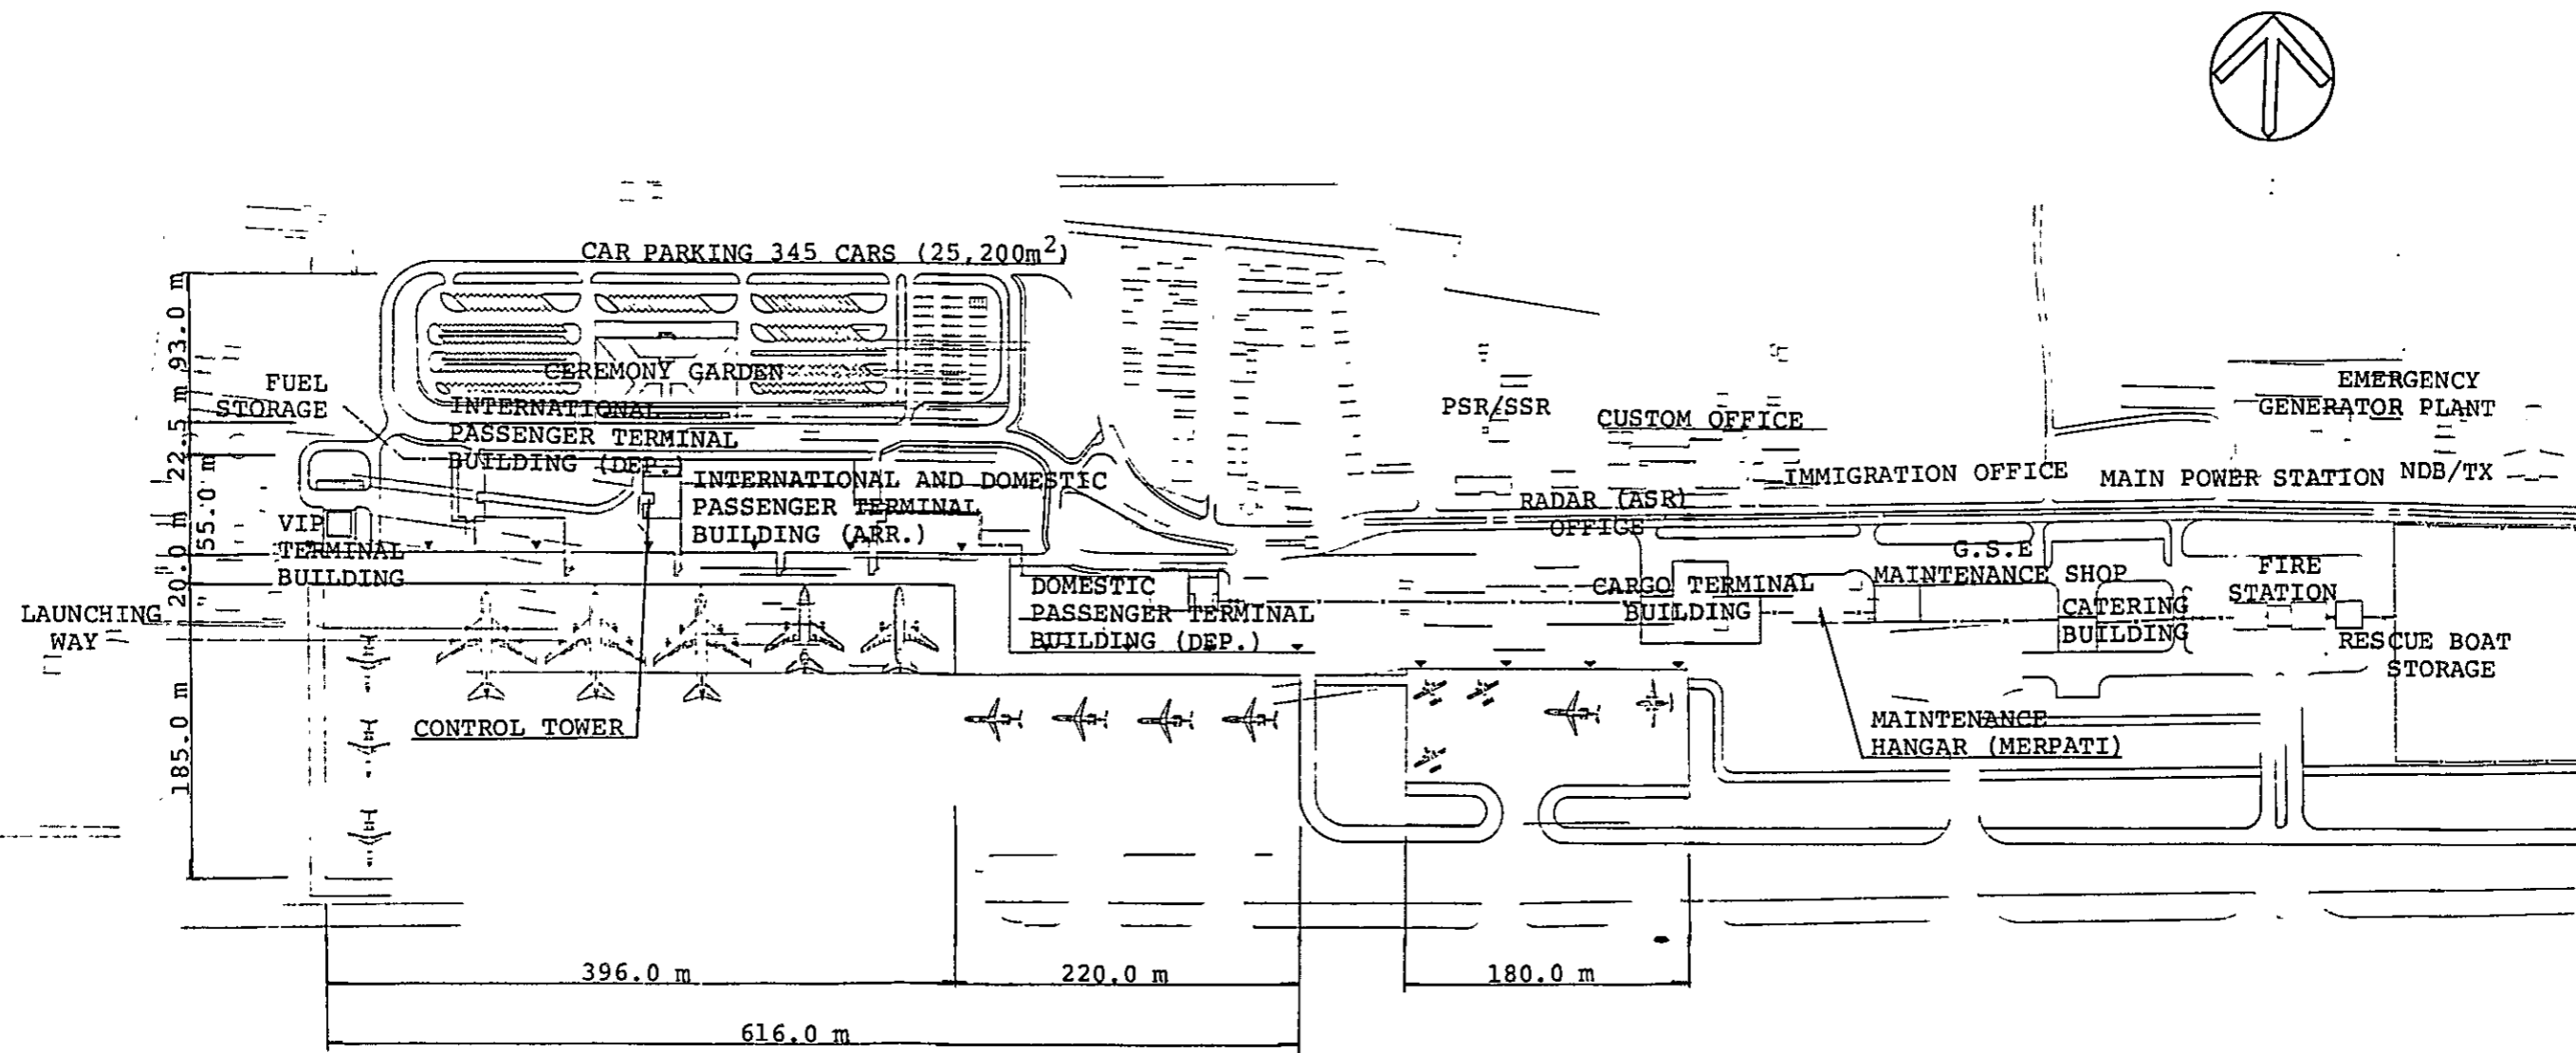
APRON DEVELOPMENT PLANS
